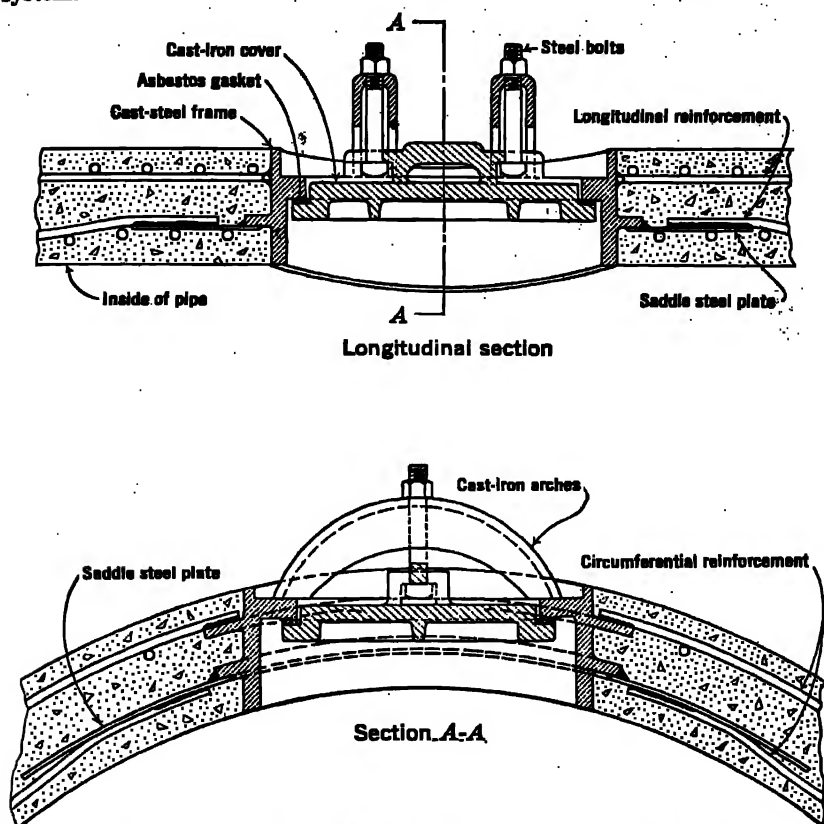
Manhole for standard 14" x 16" opening in reinforced-concrete pipe. (Lock Joint Pipe Co.)
